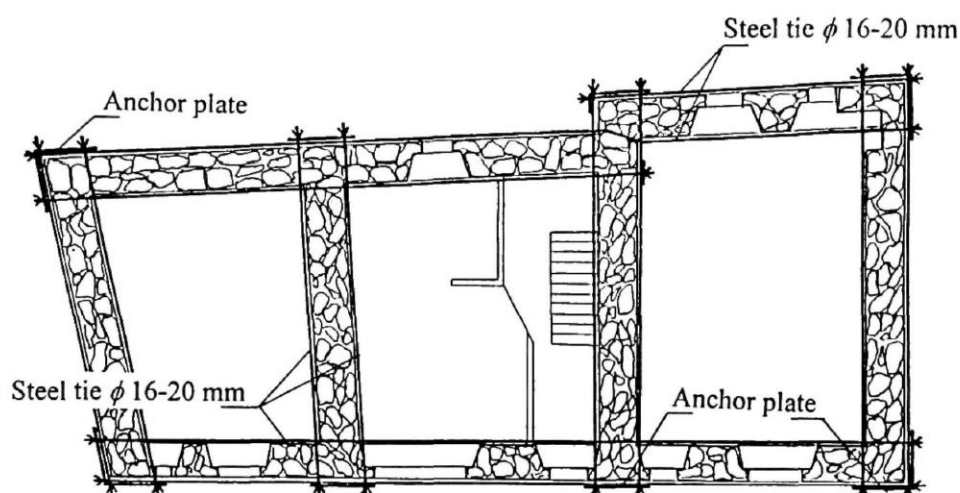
Position of steel ties in plan (Tomažević, 1999).
